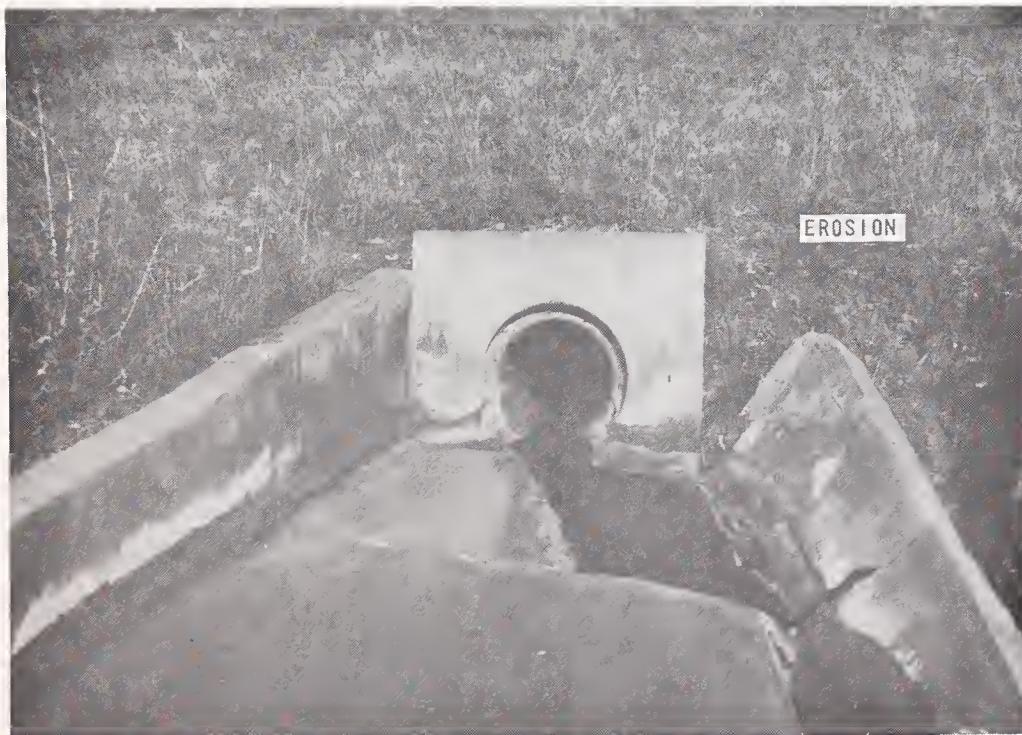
VAUX #2 NORTH ABUTMENT AND OUTLET
